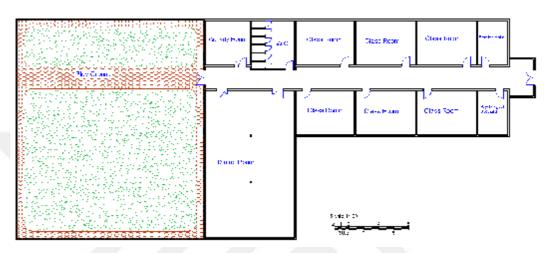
Floor plan of Tripoli C Kindergarten (Drawn by author)
